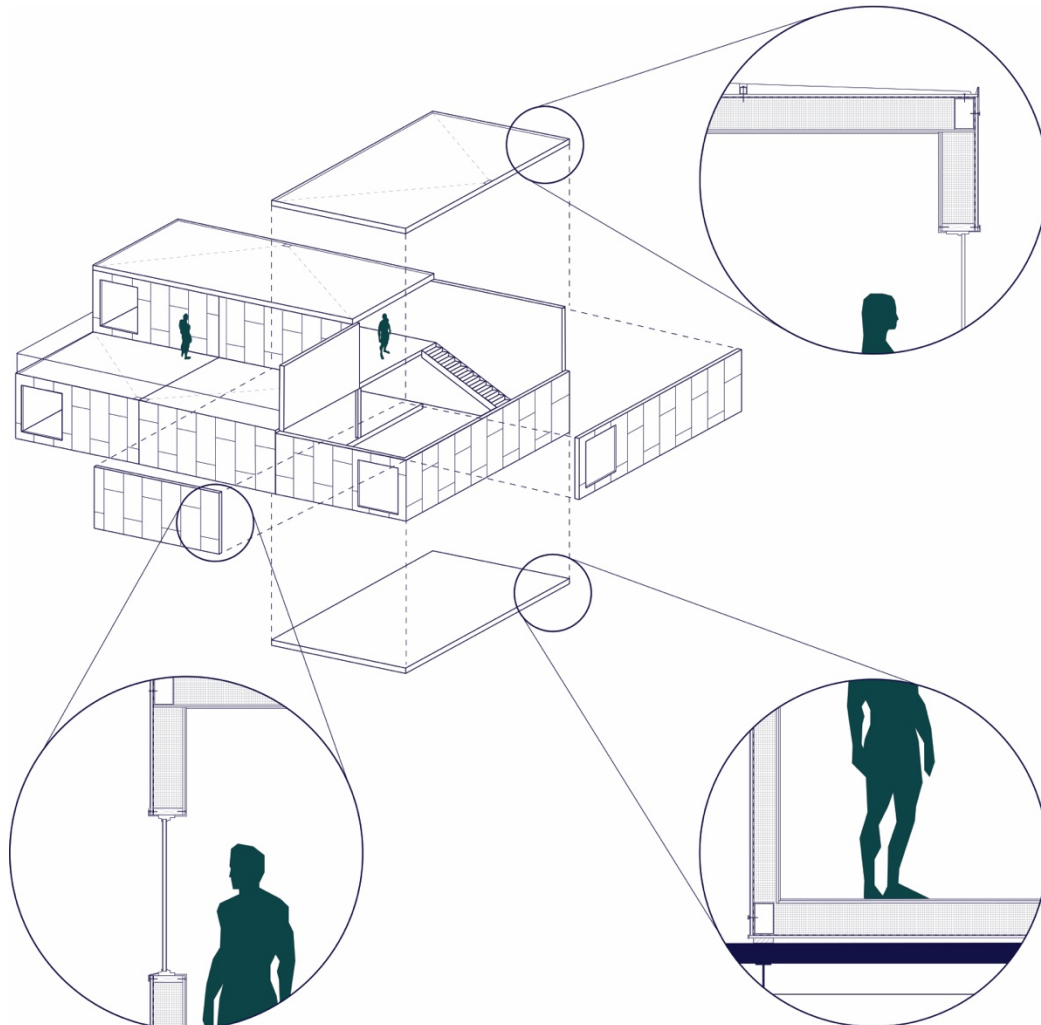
This axonometric shows call outs to the structure of the walls, floors, and roof. From exterior to interior: stainless steel panel, plywood sheathing, waterproof membrane, 4"x6" steel tube frame, soy spray foam insulation, plywood sheathing, gypsum board. (Source: author)
